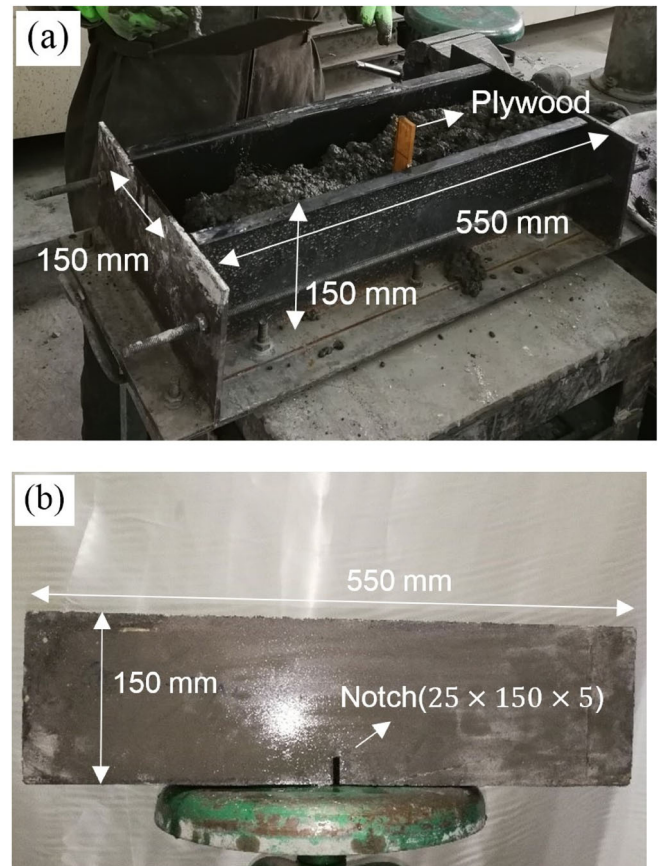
(a) Casting beam concrete and (b) beam specimen after removing mold
